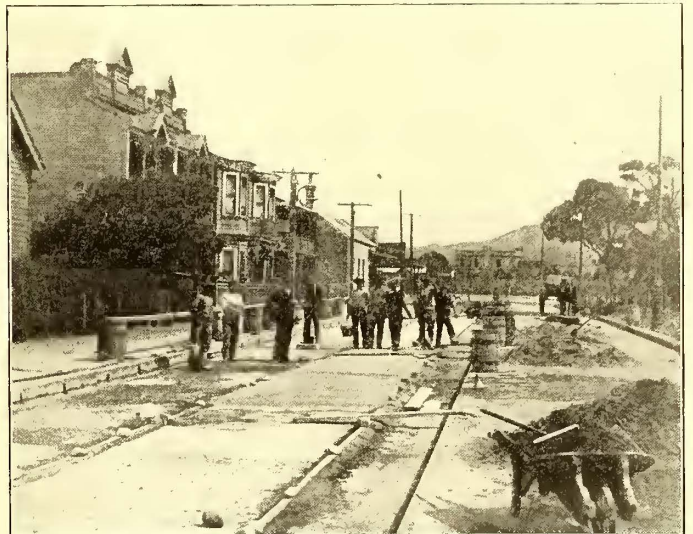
KENT TERRACE CULVERT AFTER CONCRETING
